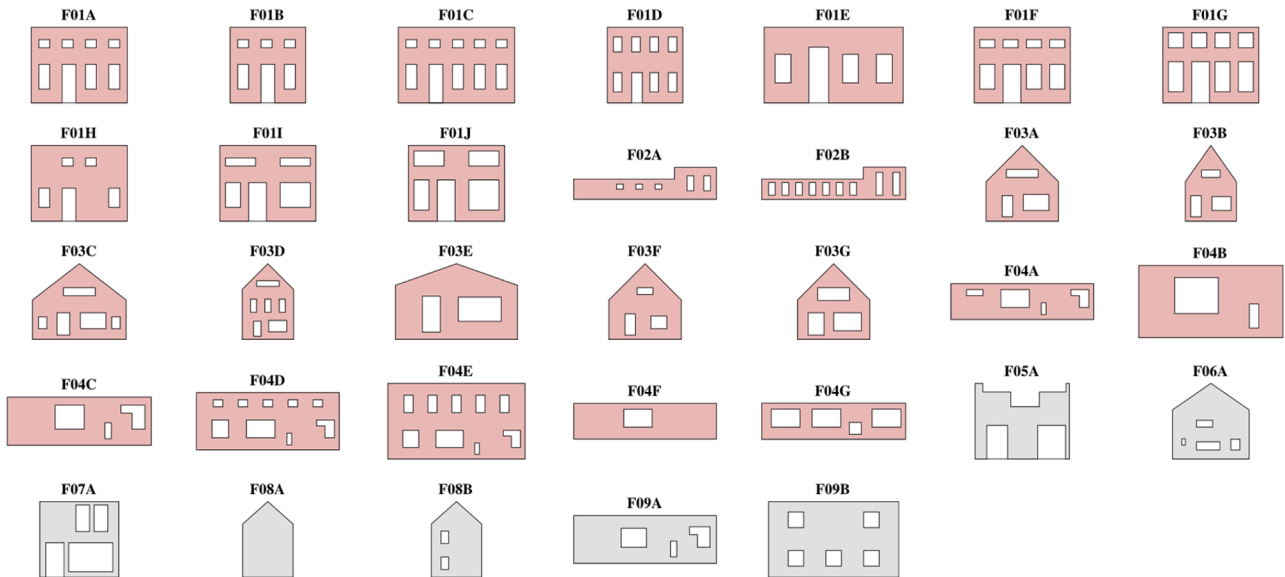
Façade geometries: in pink, fired-clay brick, and in grey, calcium-silicate brick masonry. The dimensions of the façades are provided in a dxf file, supplemental to this text.
